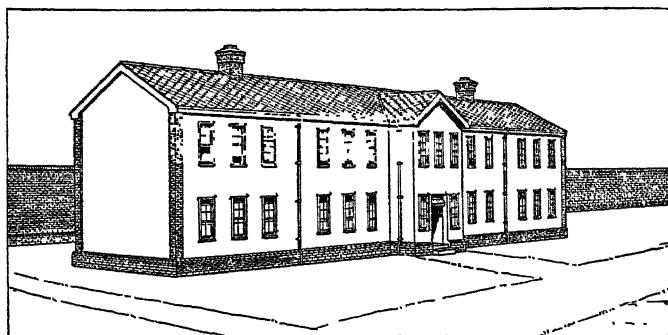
EXTERIOR OF A MODERN TWO-STOREY BARRACK BUILDING
